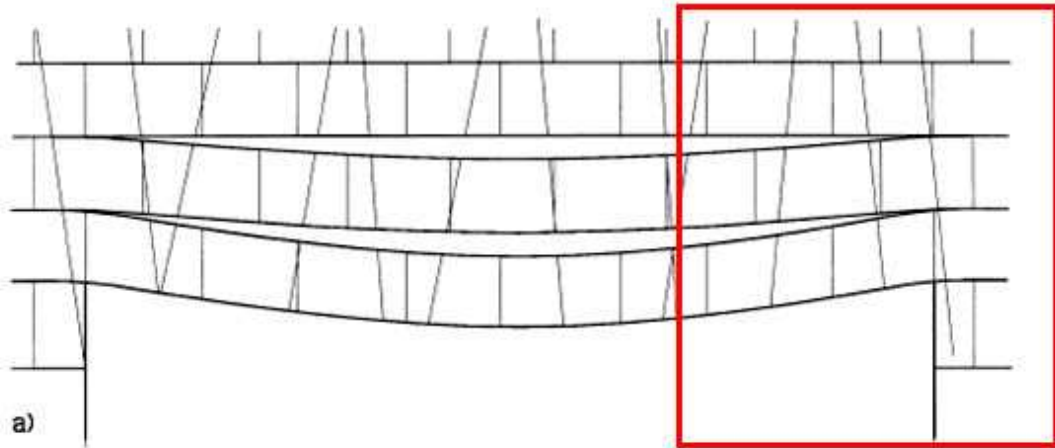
Yielding of roof strata over an excavation. The red zone marks the detailed area in Figure 2.14 (Figures adapted from Diederichs and Kaiser, 1999).
